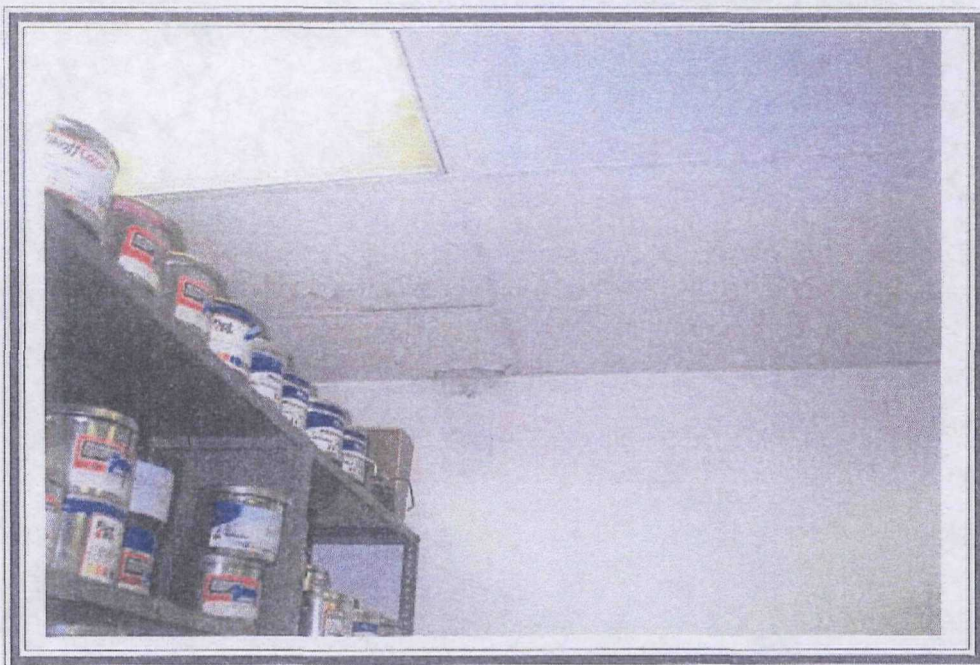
Minor damage to a 2' x 4' ceiling panel in the ink storage room.
